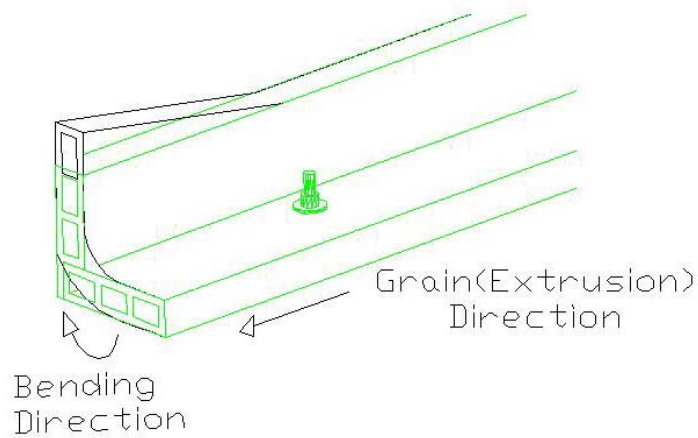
Cross-grain bending of sill plate due to eccentricity between sheathing connection and anchor
